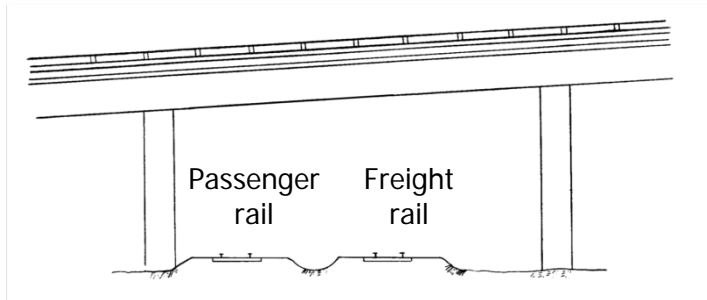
Bridge elevation view with one passenger rail and one freight rail track below the bridge.
